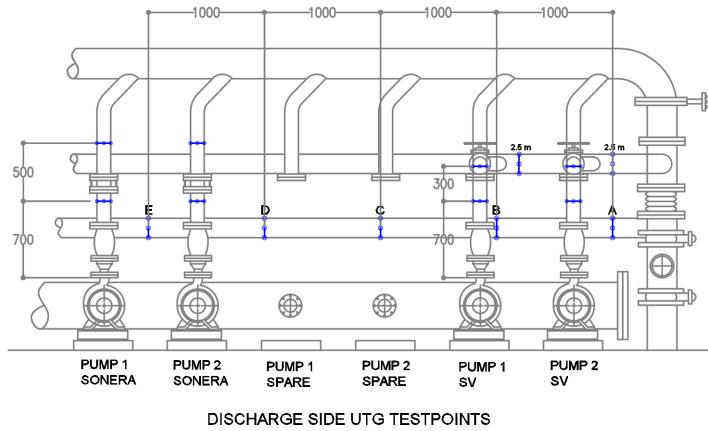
Positions and distances of UTG - Booster Pump Discharge Side
